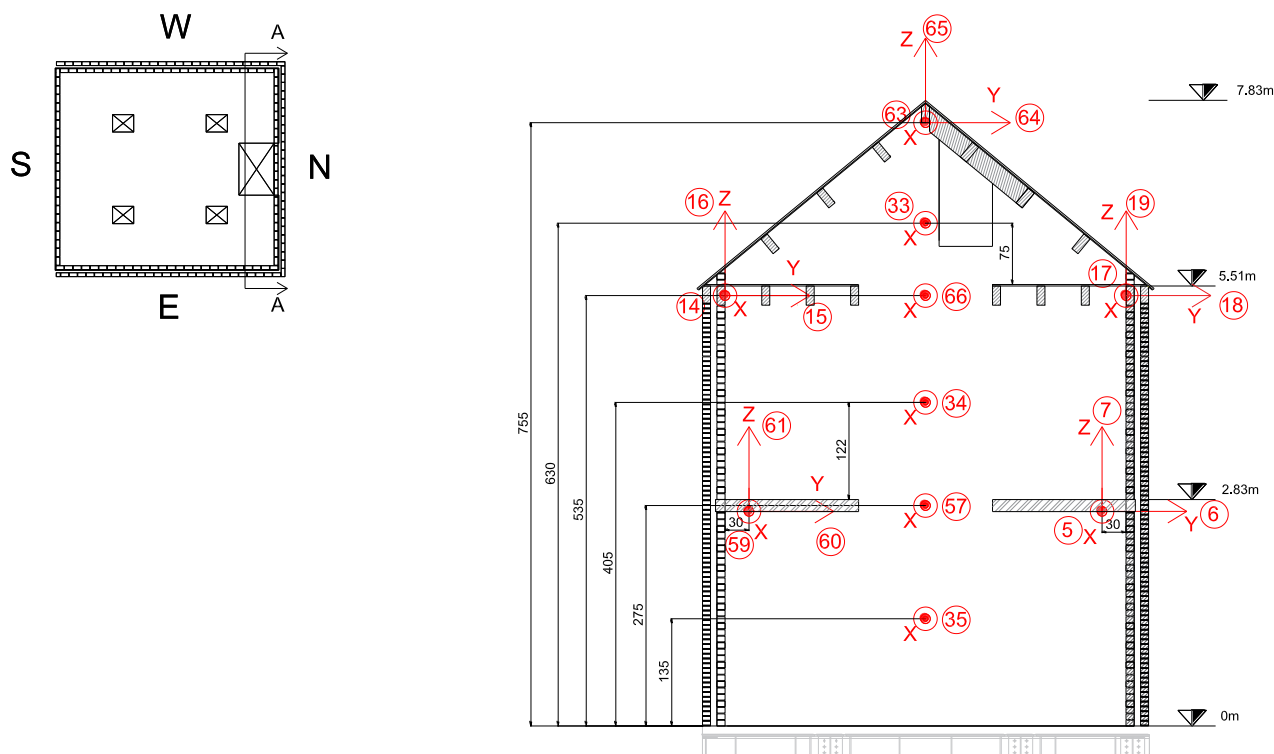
Accelerometer elevation: North calcium silicate inner leaf - Section A-A.
